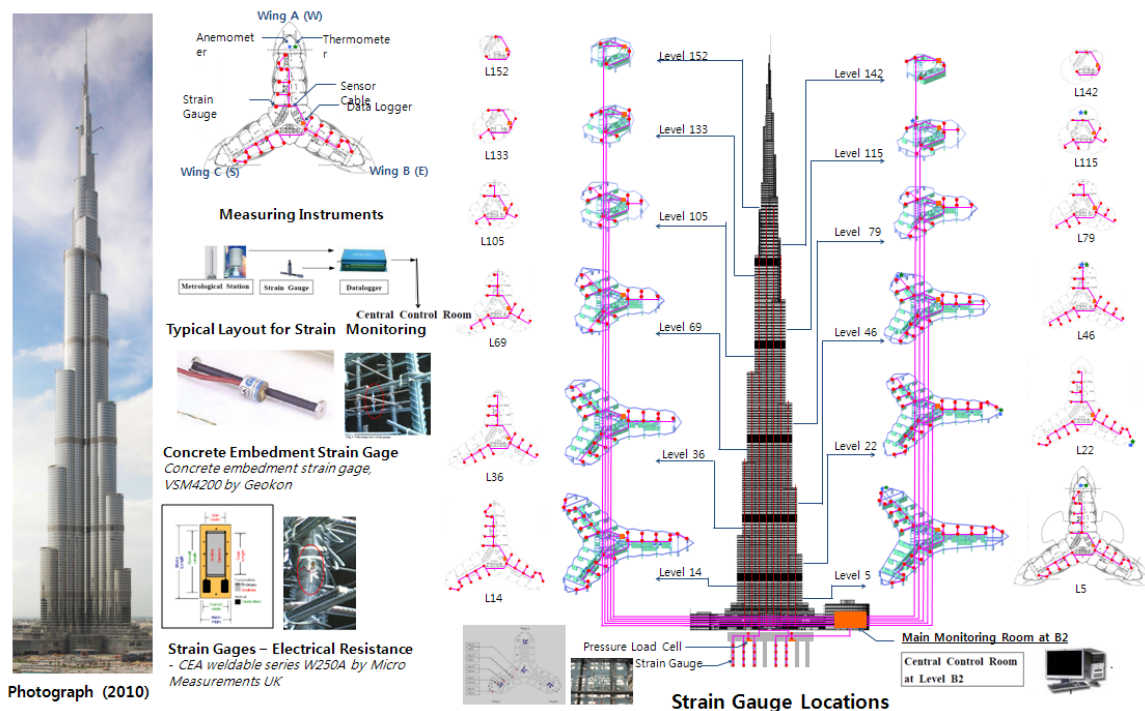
Typical Strain Gauge Monitoring System Layout at column/walls/Pile/Raft foundation
